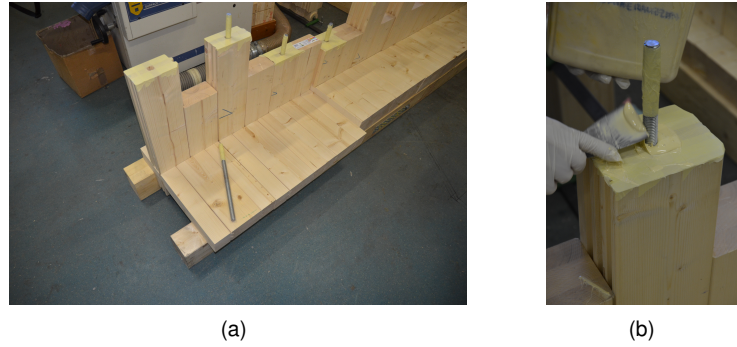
Samples assembly - glued in steel threaded bar (epoxy resin)
